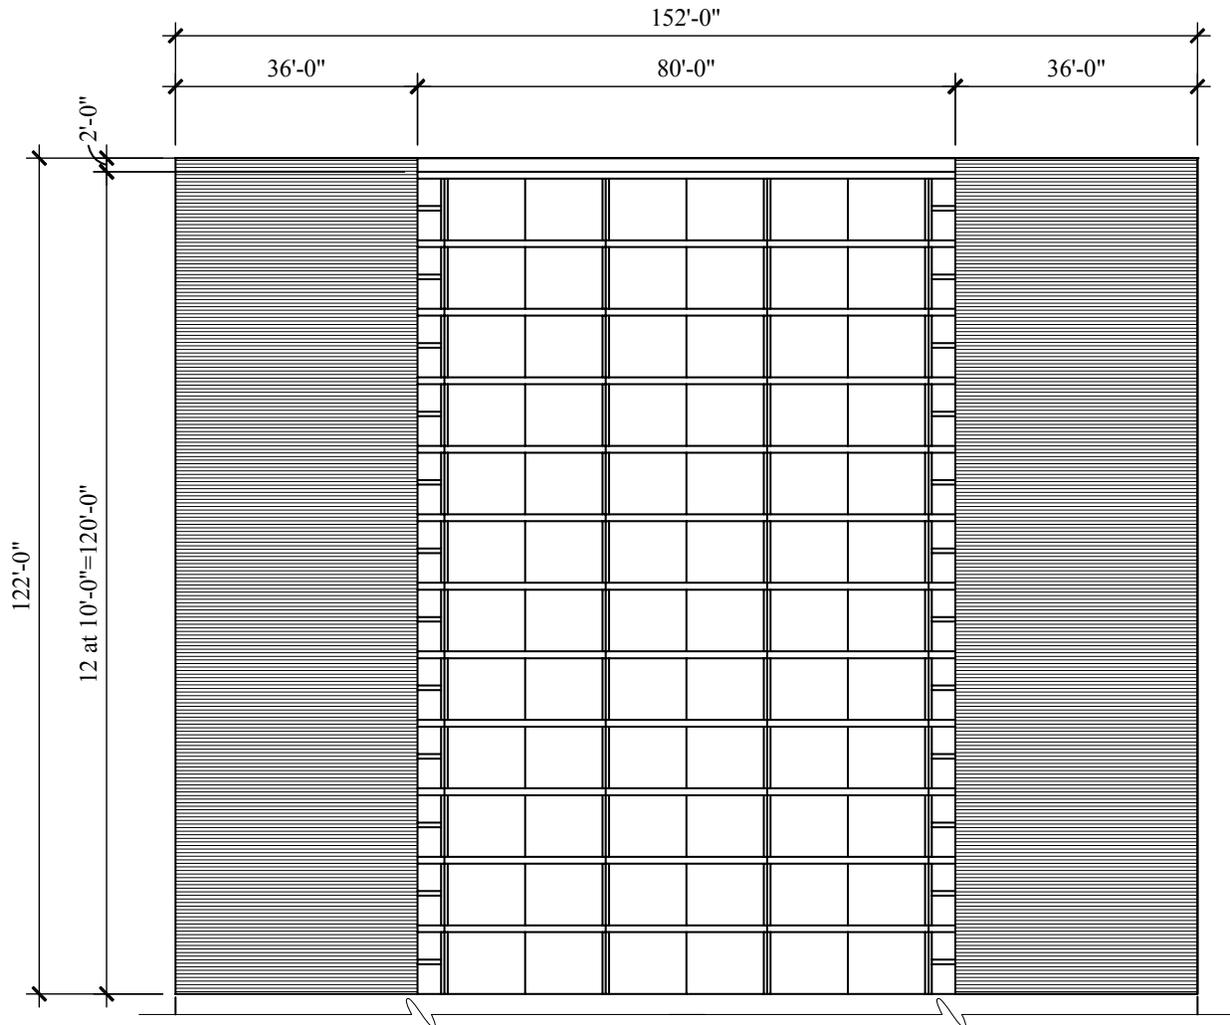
Elevation (1.0 ft = 0.3048 m, 1.0 in. = 25.4 mm)
